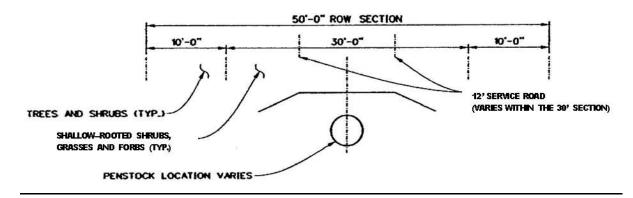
C. Typical cross section of penstock ROW with service road, per FERC-approved construction drawing YCH-1116.
